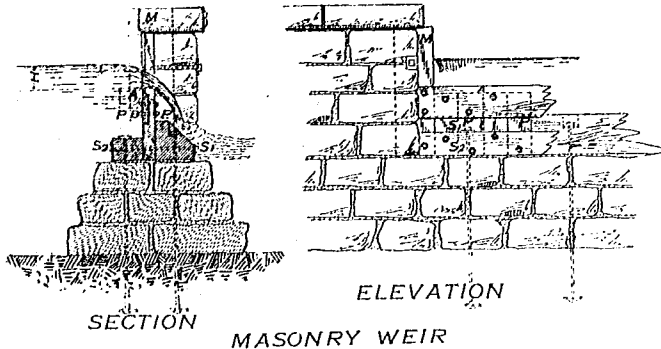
MEASURING WEIR ON ROCK BOTTOM.
